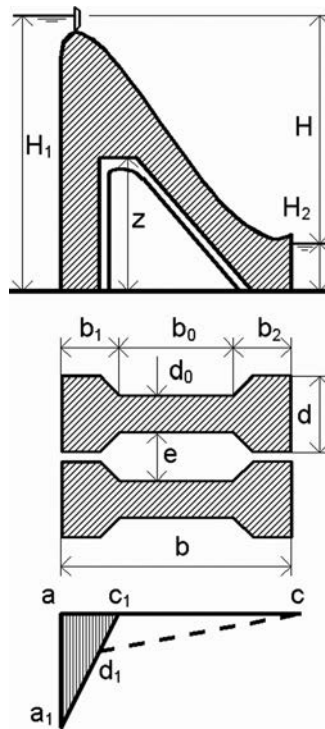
Hollow gravity dam. (a) Cross-section; (b) layout of two concrete blocks; (c) diagram of uplift pressure.
